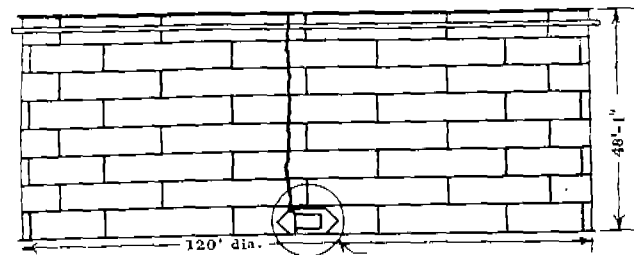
Failed crude oil storage tank showing path of the crack through the tank shell
